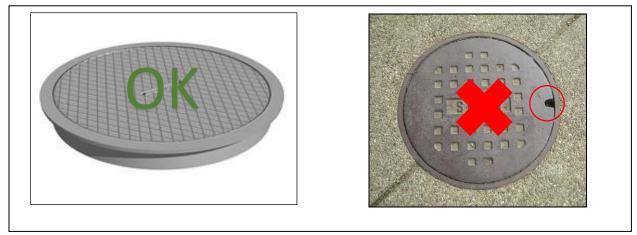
Example of a Mosquito Proof Manhole Access Cover (Left) and Manhole Access Cover with an Open Pick Hole (Right)
